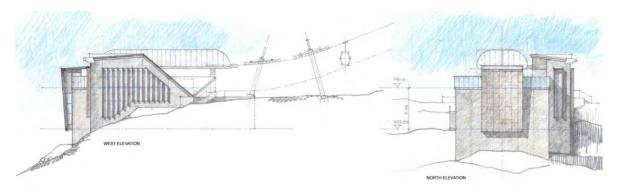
Architect's sketch of the proposed bottom terminal and chair storage building west and north elevations.
